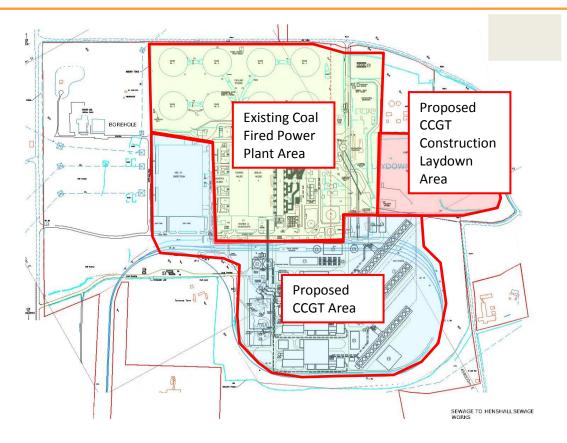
Division of existing coal-fired power station site for the purpose of drainage
